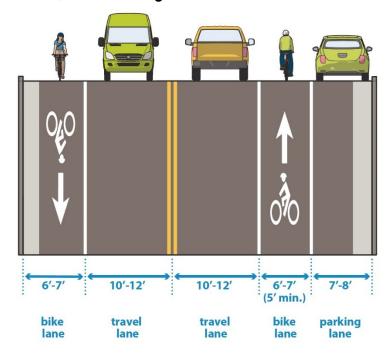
Typical Cross Section for Unprotected Bike Lanes
